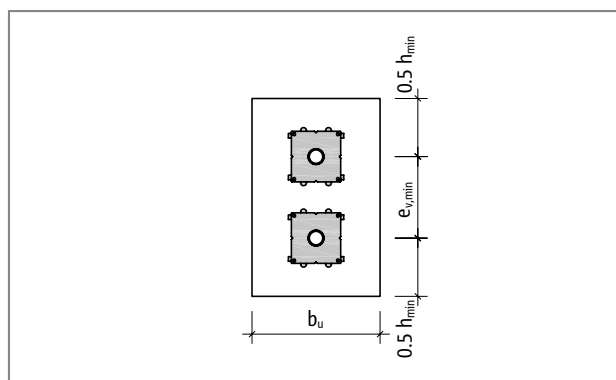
Schöck Dorn type SLD: Minimum structural component dimensions and dowel spacings in the front face of a beam or wall
